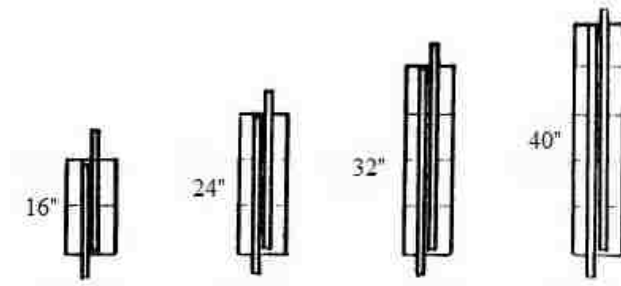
Soric & Tulin Reinforced Masonry Specimens
